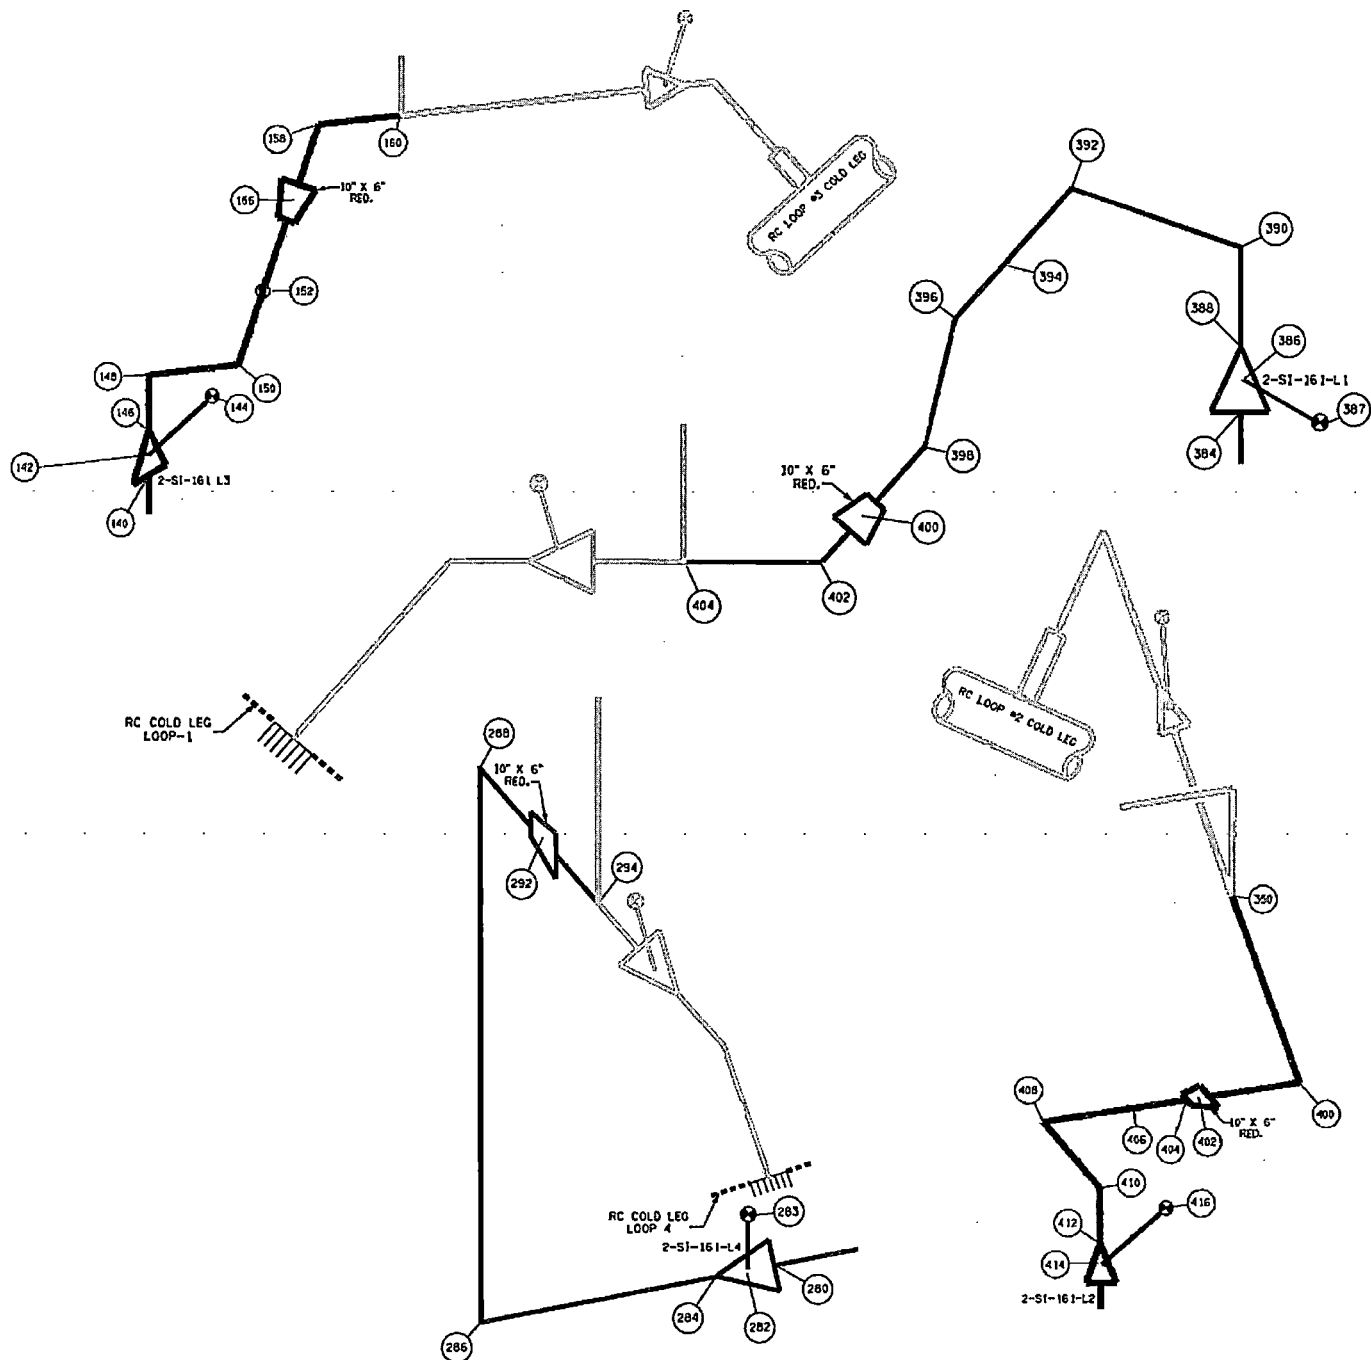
D.C. Cook Unit 2 Cold Leg SI Line Layout Showing Weld Locations with Node Points – Loops 1 through 4
